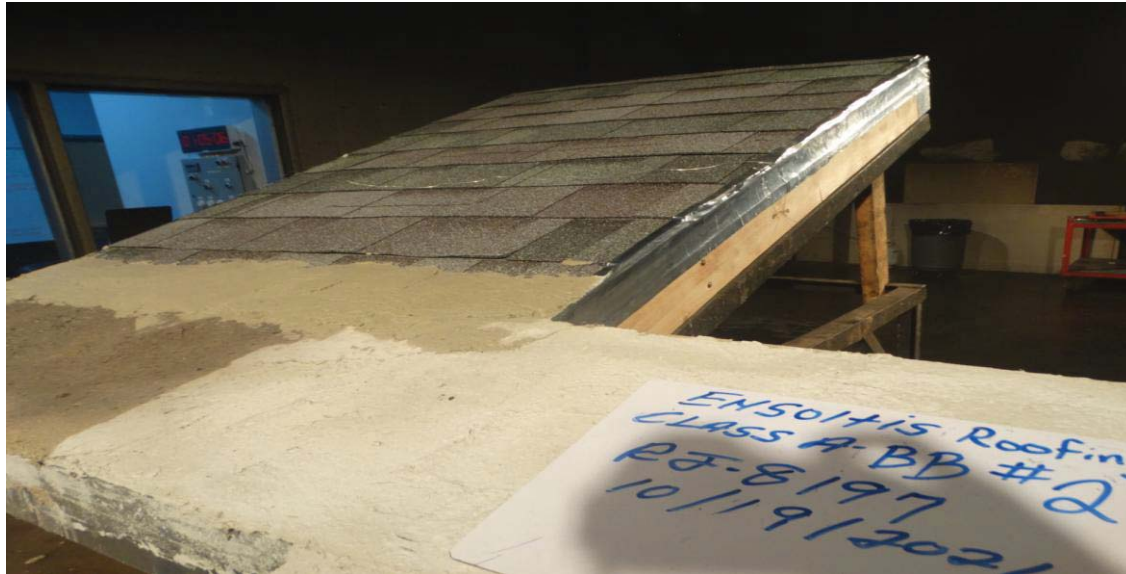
Ensoltis Above Roof Deck Thermal Insulation System.
